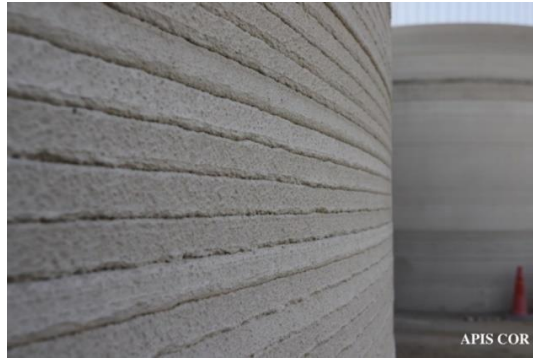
The wall is built using the concrete 3D printing method [1].
